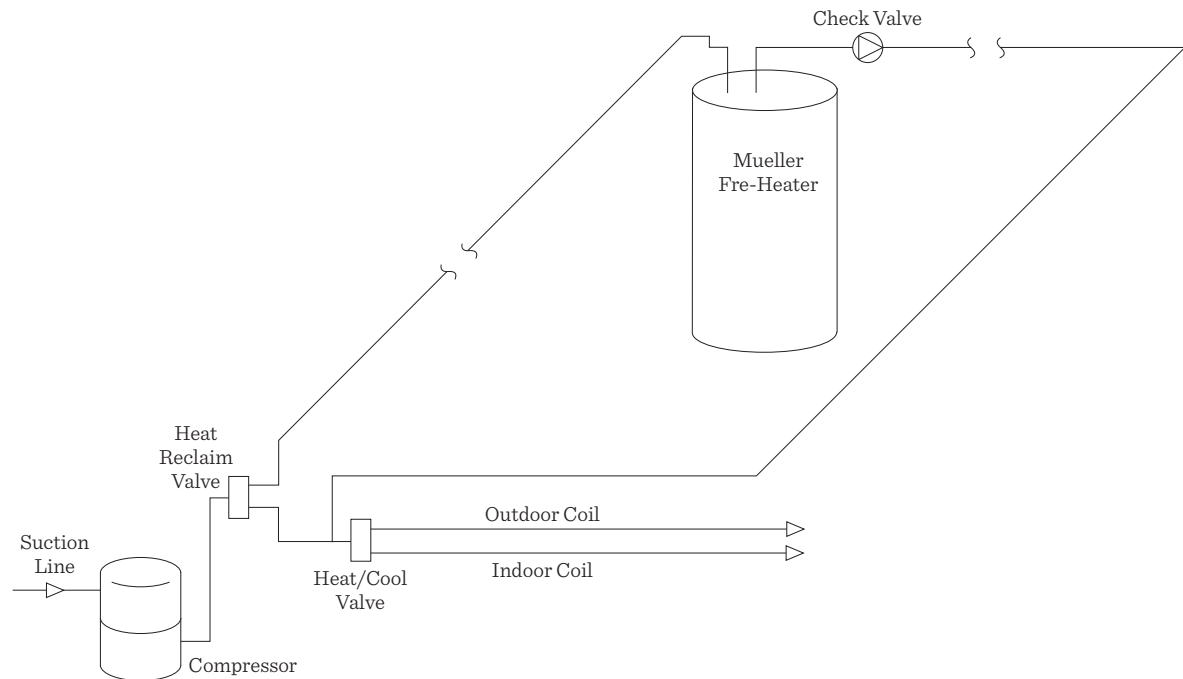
TYPICAL HEAT PUMP REFRIGERANT PIPING DIAGRAM
